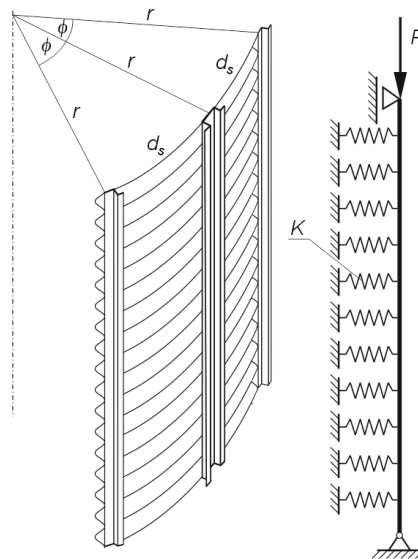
Silo wall stiffener as a rod resting on elastic foundation
